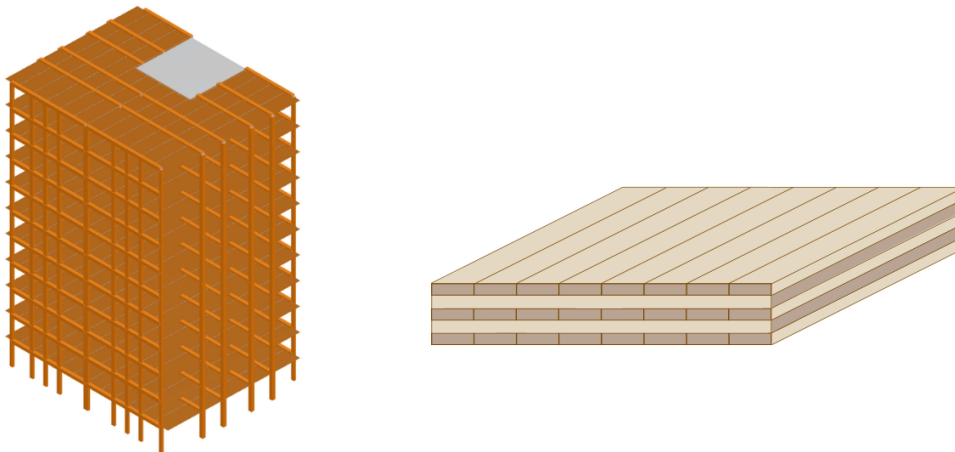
Hybrid concrete–core timber frame structure (left) and cross-laminated timber floor panel (right).
